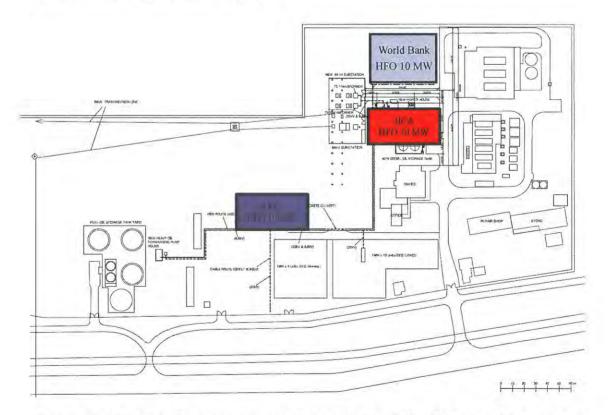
Power Plant Construction Plan by own fund, World Bank and Japanese aid
